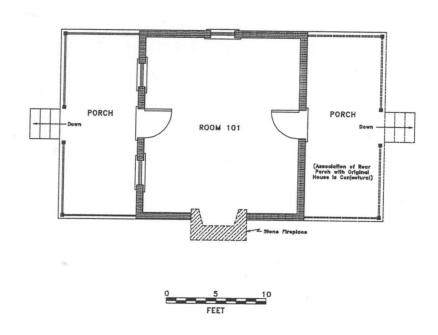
Ground floor plan of the Allard House, as originally constructed (ca. 1810).
